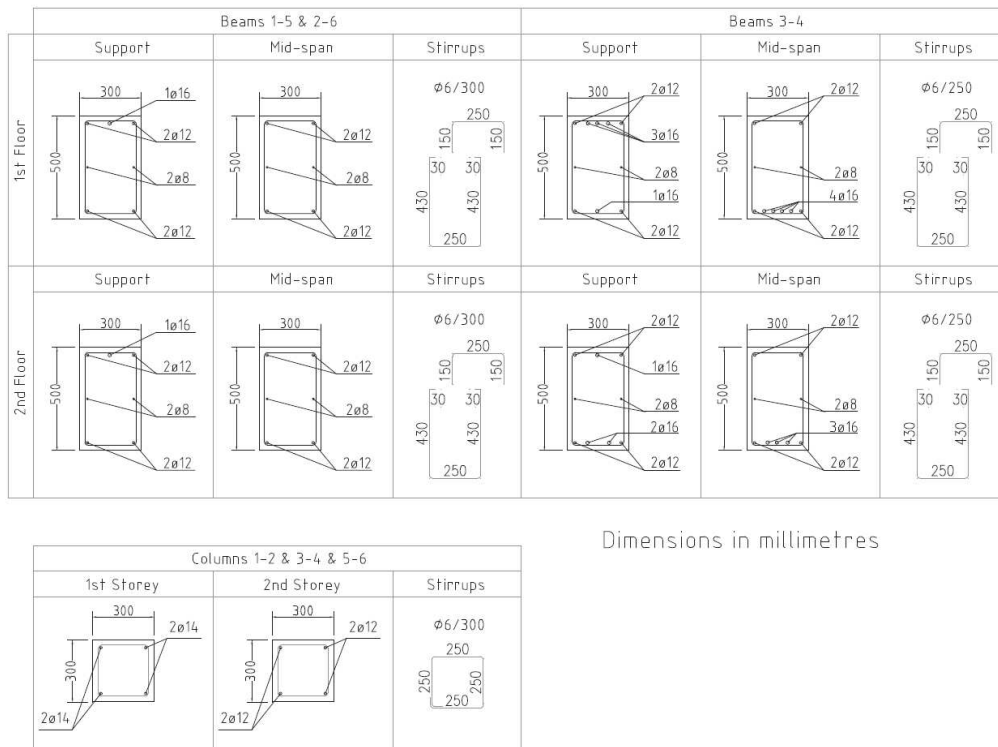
Beam and column cross-sections layout and steel reinforcement of the RC frames [10].
